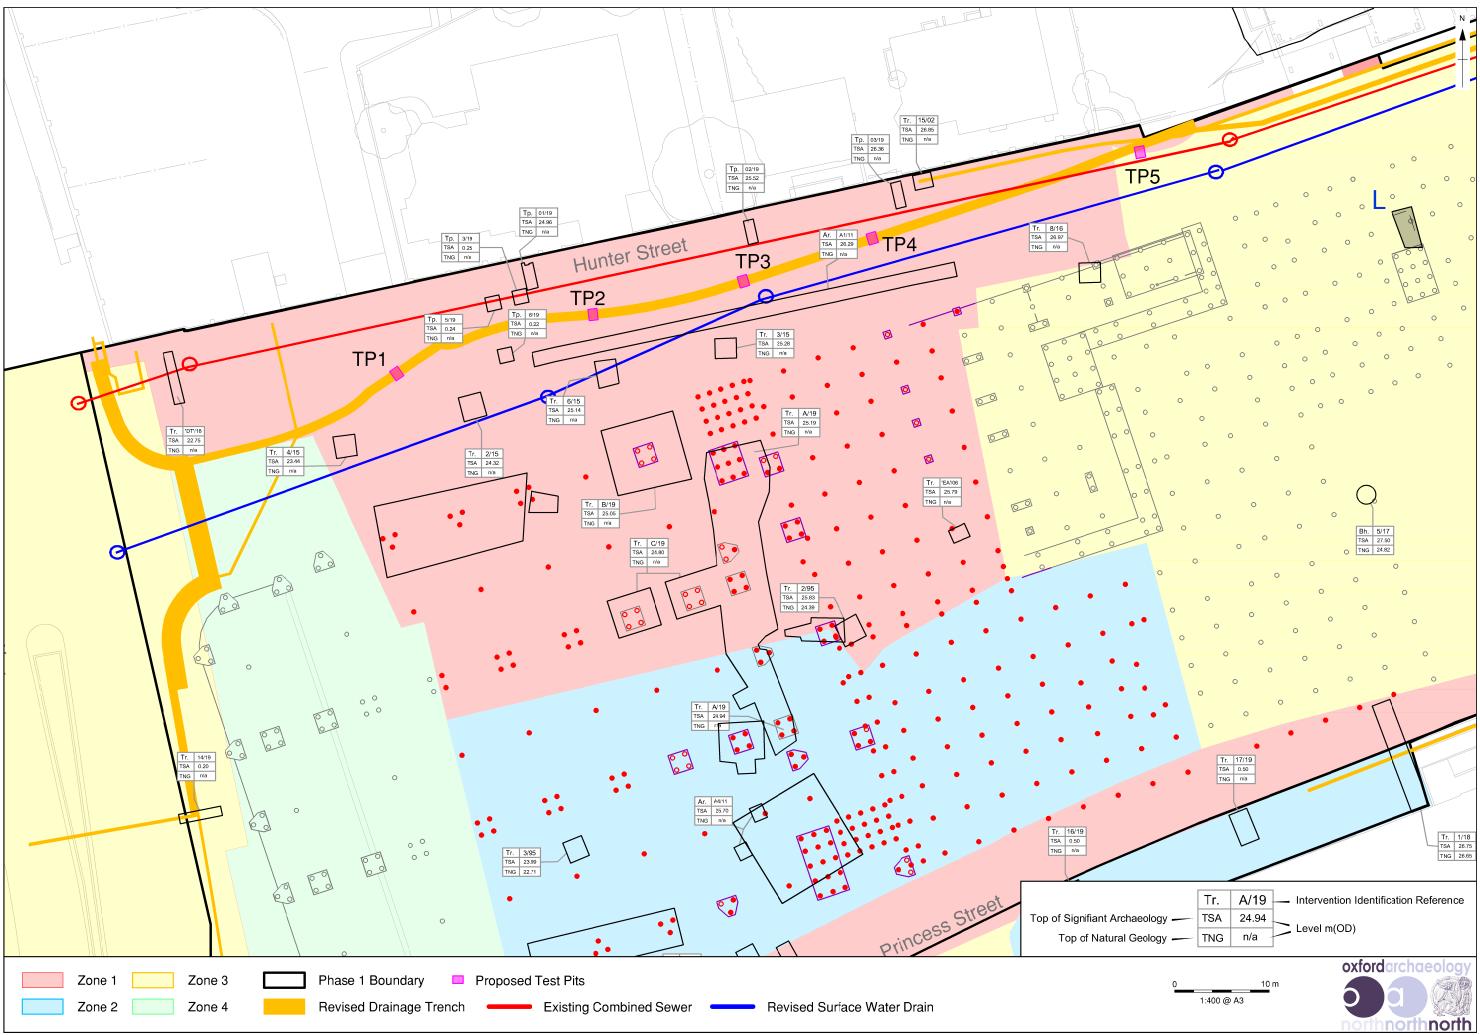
Proposed test pits, with revised drainage trench and surface water drain
